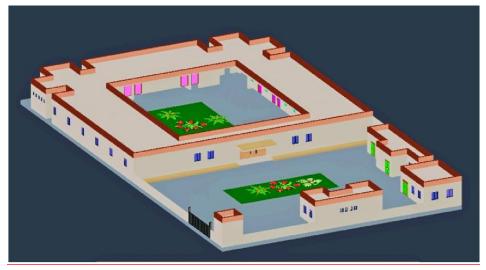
3D LAYOUT OF SCHOOL BUILDING
